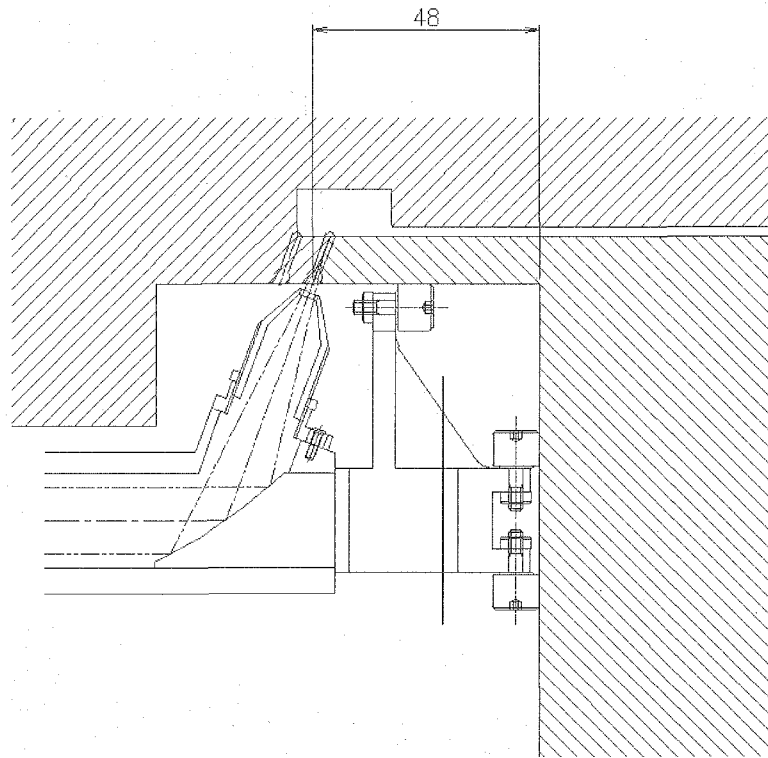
Schematics of Positioning System for FW Support beam Welding at 1st term
